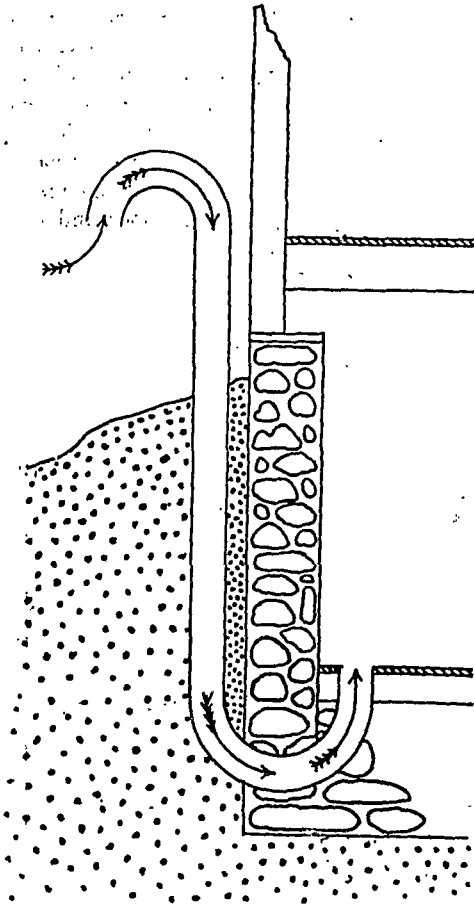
SECTION OF WALL SHOWING PRINCIPLE OF INLET.
